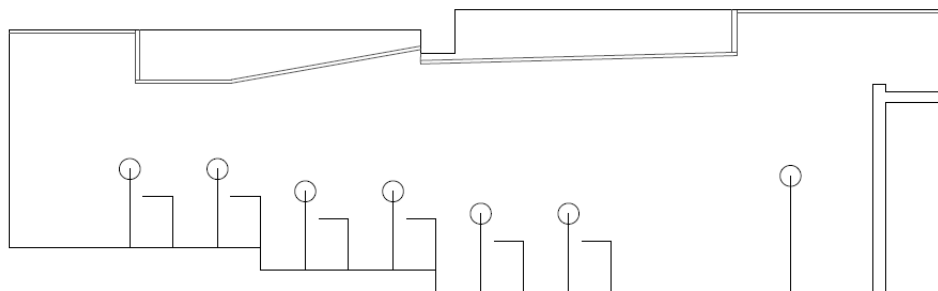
Section of Lecture Hall – Proposed Ceiling Reflectors
